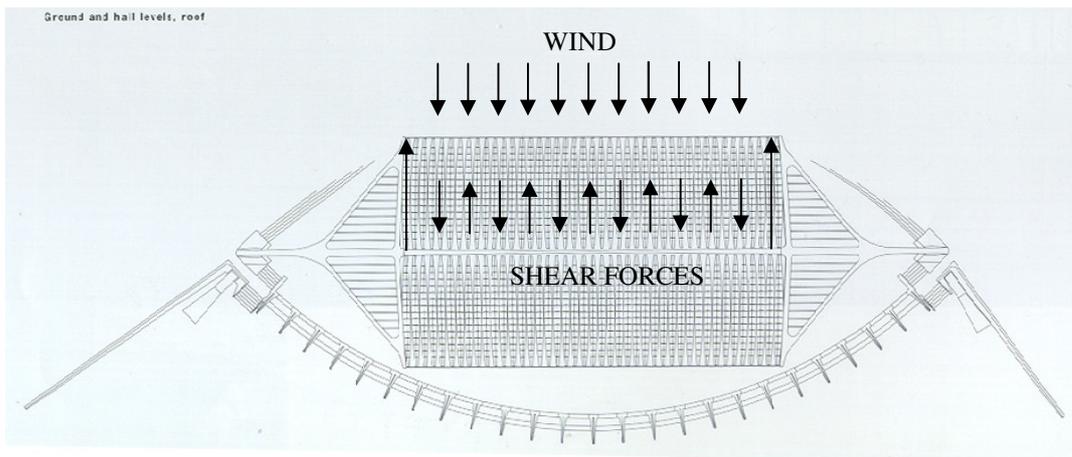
Roof Plan, Asymmetric Loads (horizontal component of wind loads) Tenerife Exhibition Center, 1992
